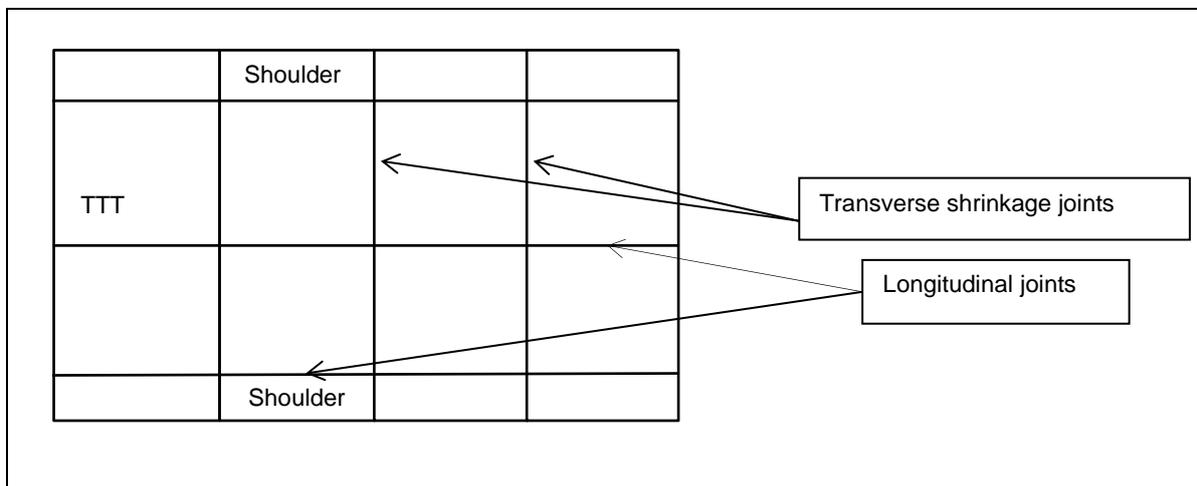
Jointed concrete pavements with sealed transverse and longitudinal joints
